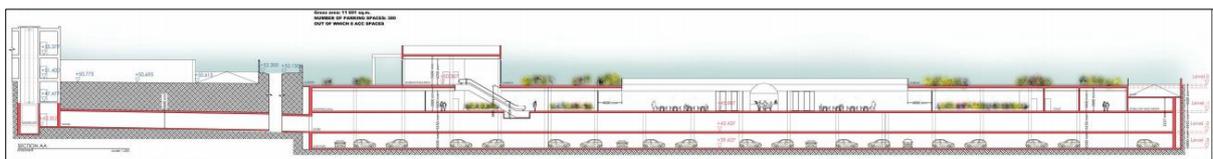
Indicative section of proposed development (Source: PA/02454/19 – 1m)
